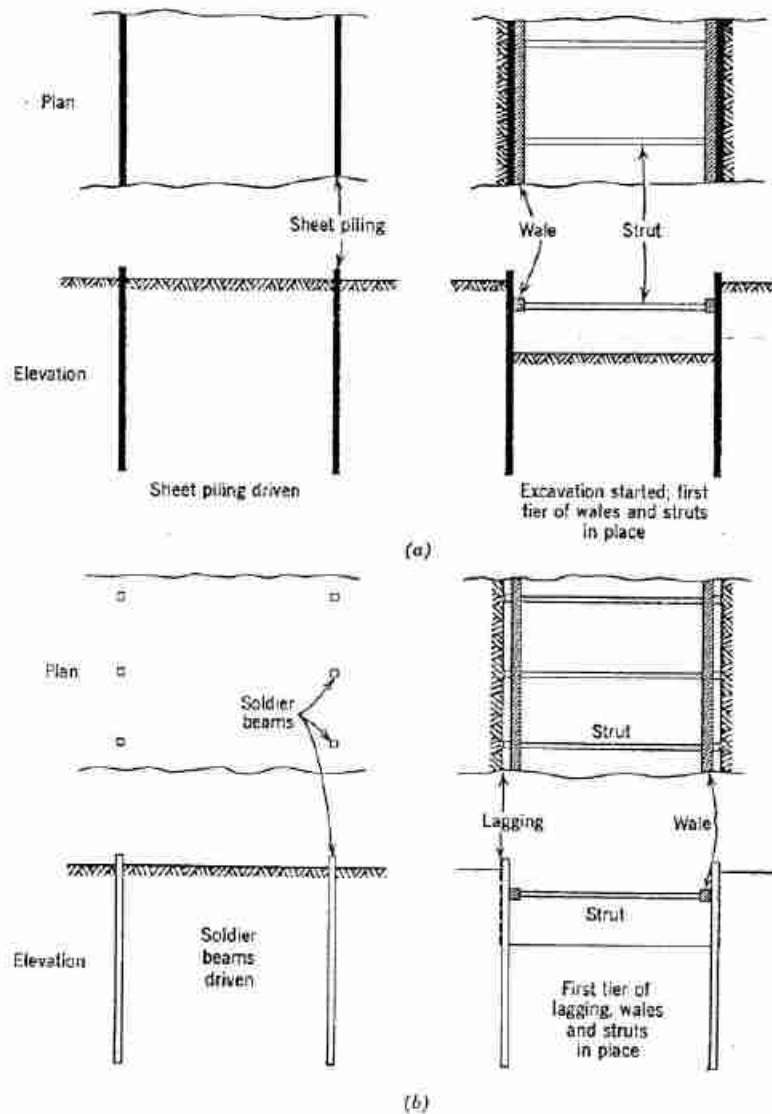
Systems for installing bracing. (a) Braced excavation using sheet piling. (b) Braced excavation using soldier beams and lagging.
